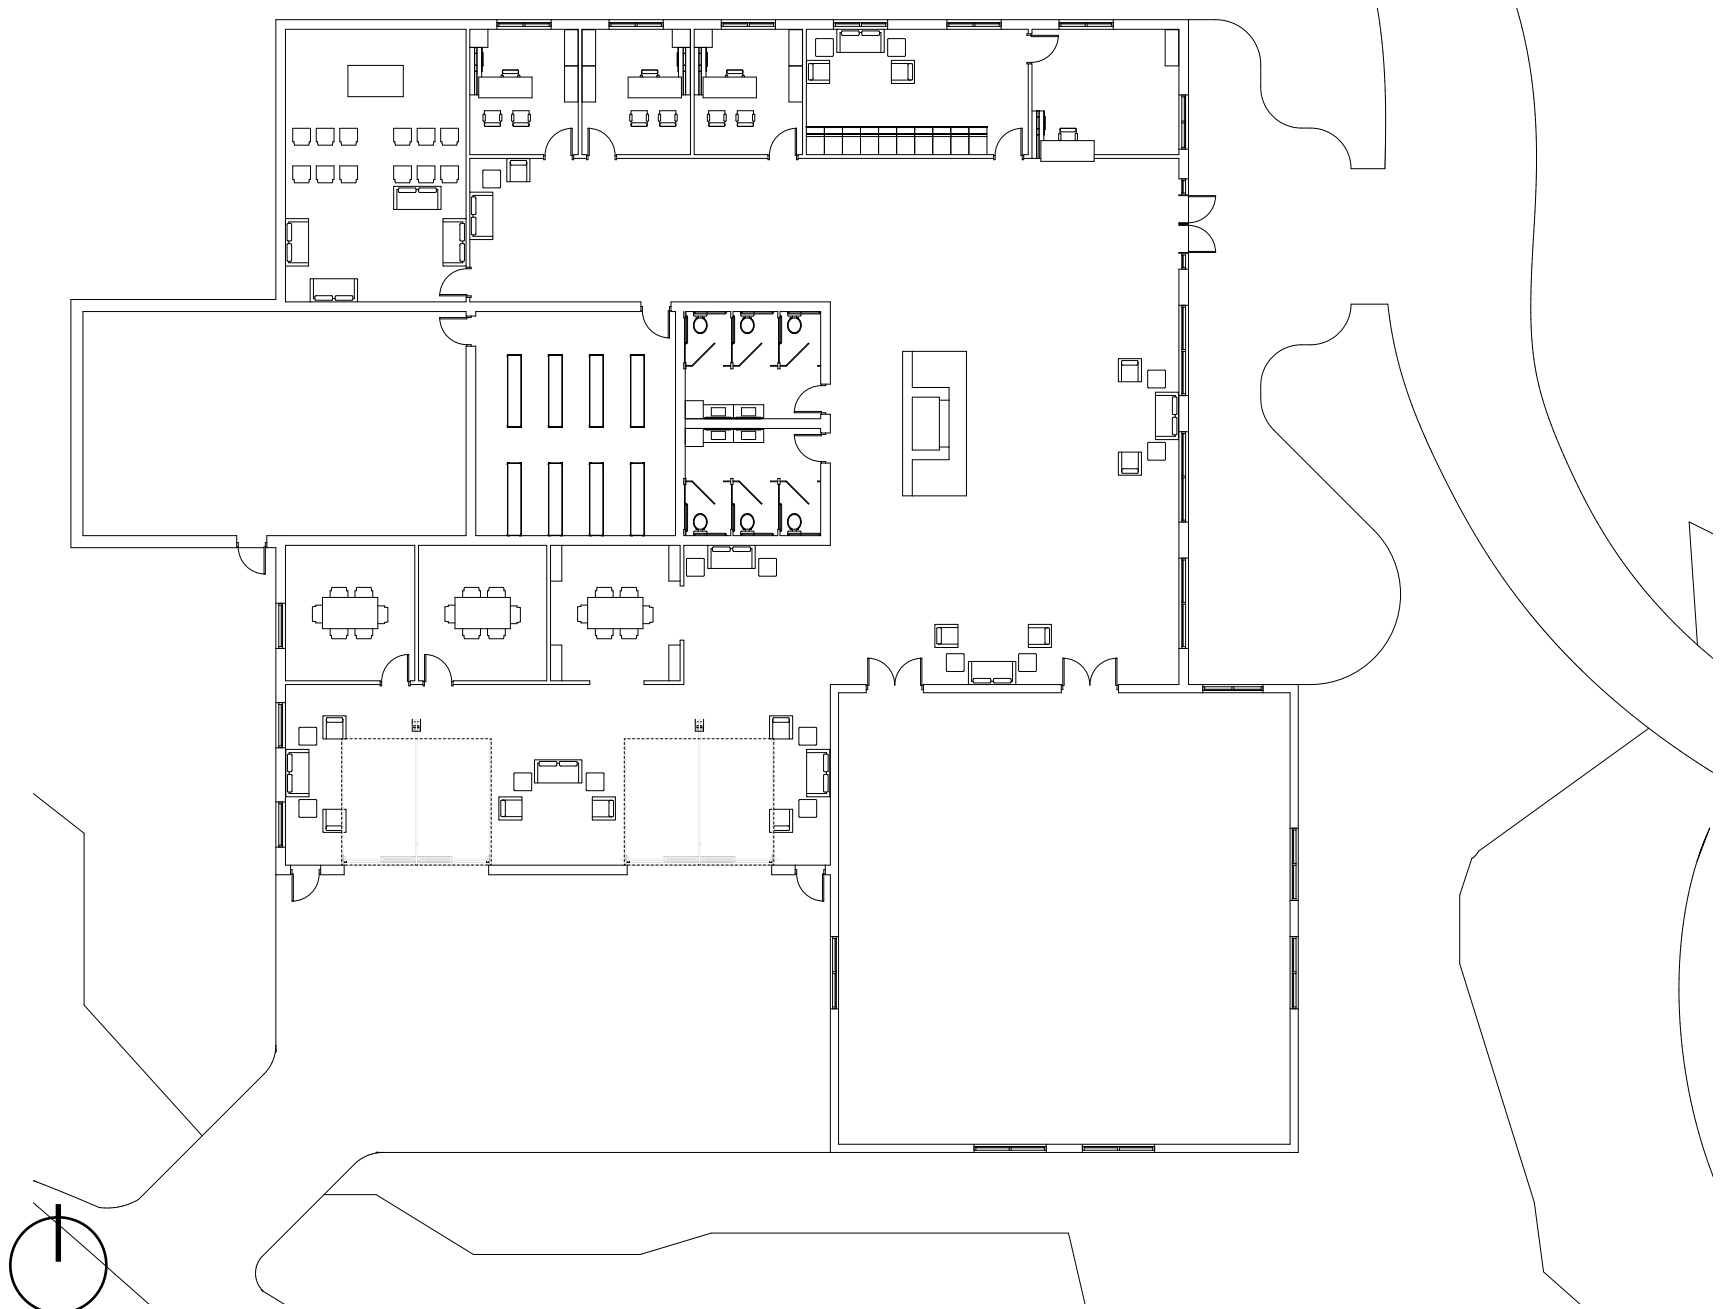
ADMINISTRATION CENTER FLOOR PLAN
